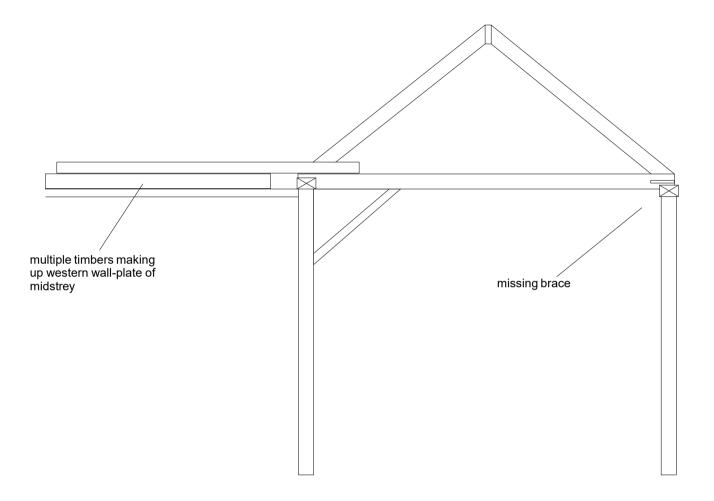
East facing truss of barn, highlighting tie-beam between bays 3 and 4.
